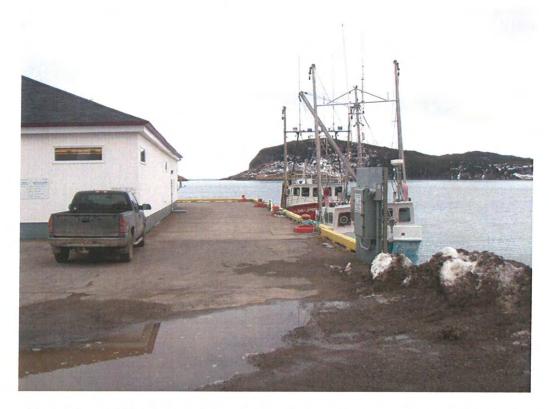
Standing water observed in asphalt parking area, looking southeast.
